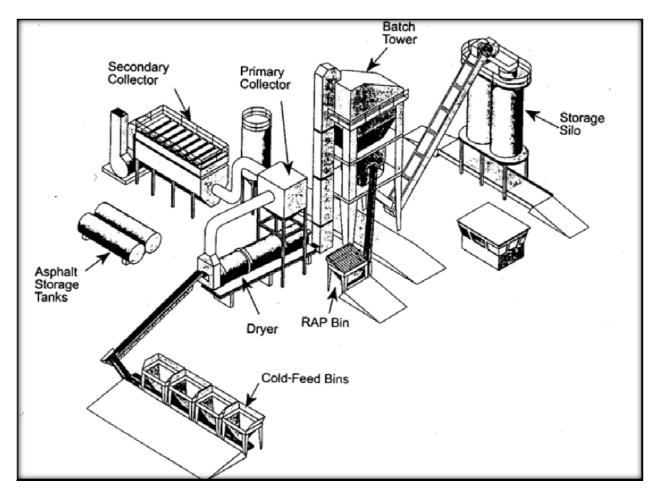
GENERAL LAYOUT OF THE BATCH PLANT (QA MANUALS)
